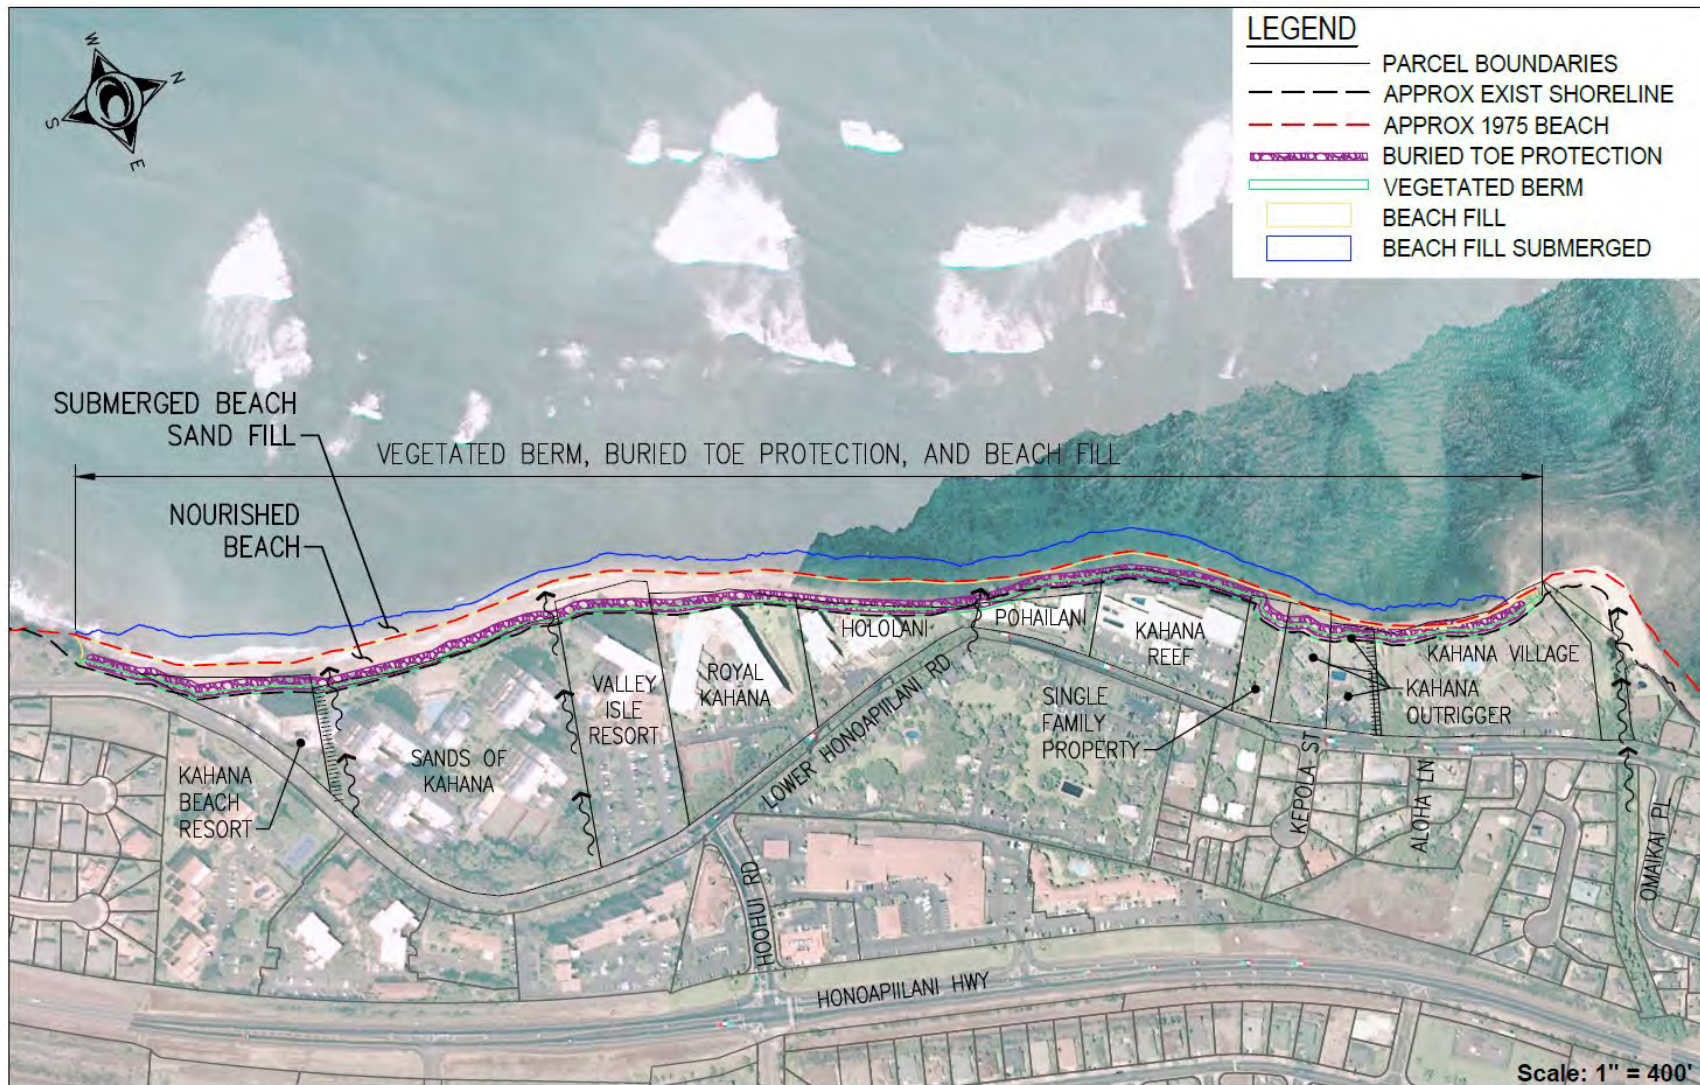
Secondary Alternative: Beach Nourishment without Stabilizing Structures
